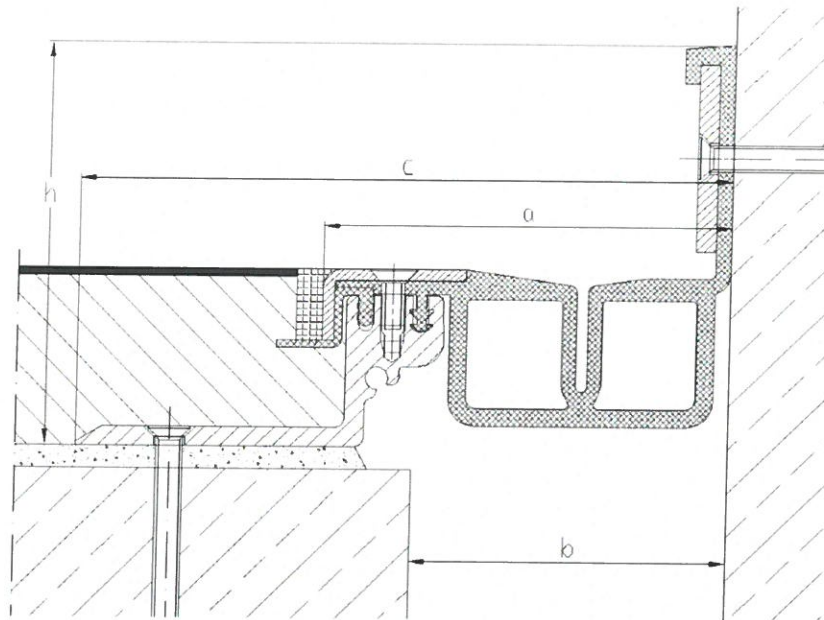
CONECTO PARK GA 88.45.CV S waterproof expansion joint profile
